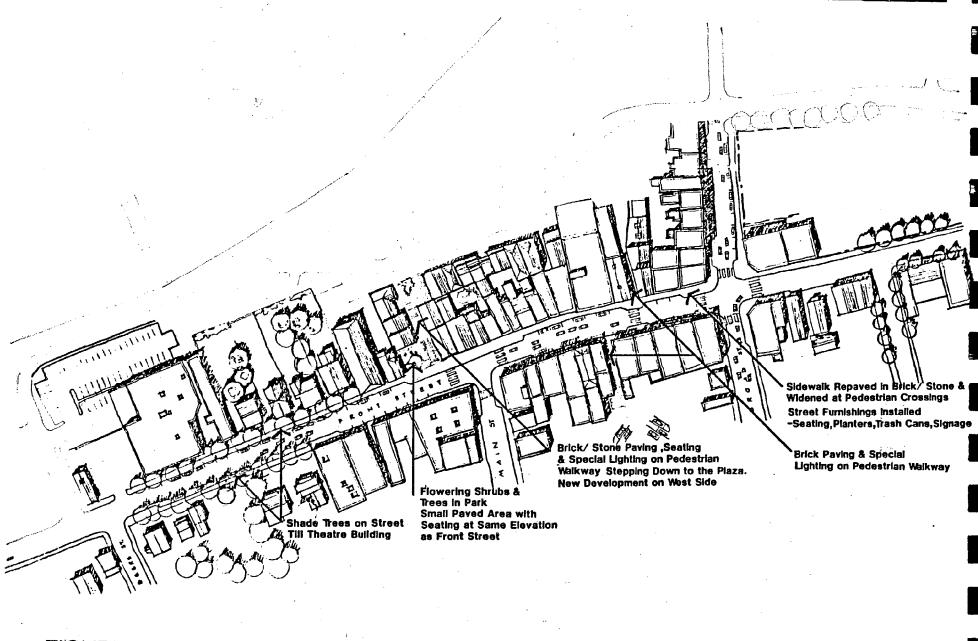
DOWNTOWN ELEMENT ILLUSTRATIVE PLAN
